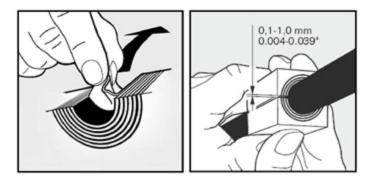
Adapting a Module to the Cable Size, Checking the Gap
